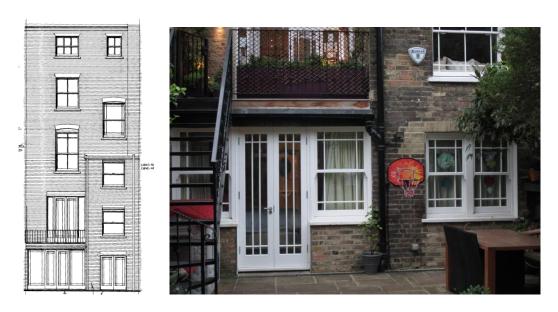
2005 drawing of rear elevation, and existing lower ground floor openings
